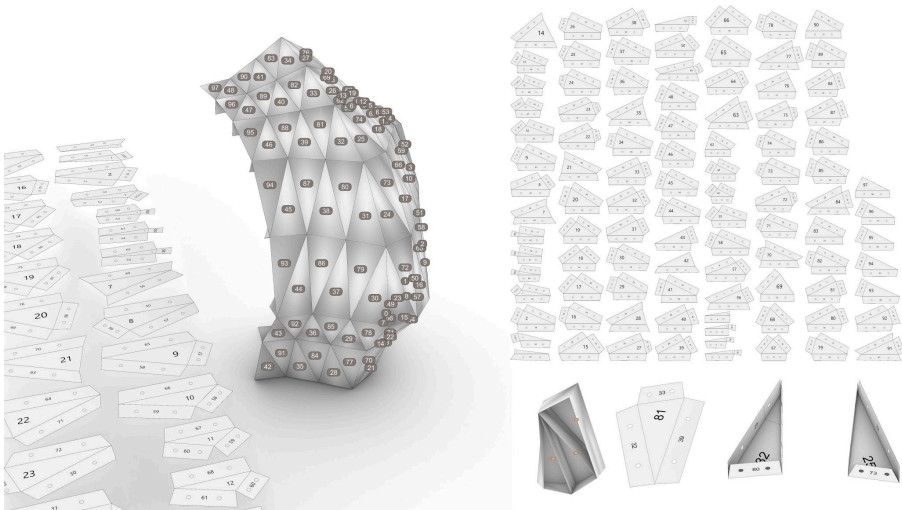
Output of tessellation script (Left: Tessellation script output showing surfaces tags and 2D cutting sheets for panels, Right: 2D cutting sheets showing 3D assembly, panel engraved boundaries and cuts for connection pins).
